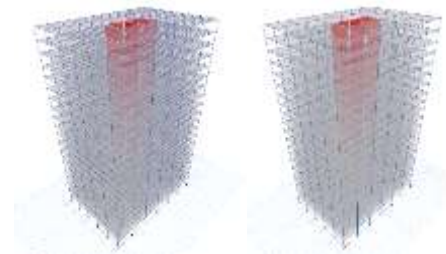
Plan of the RCC & Steel Composite G+20 structure.
